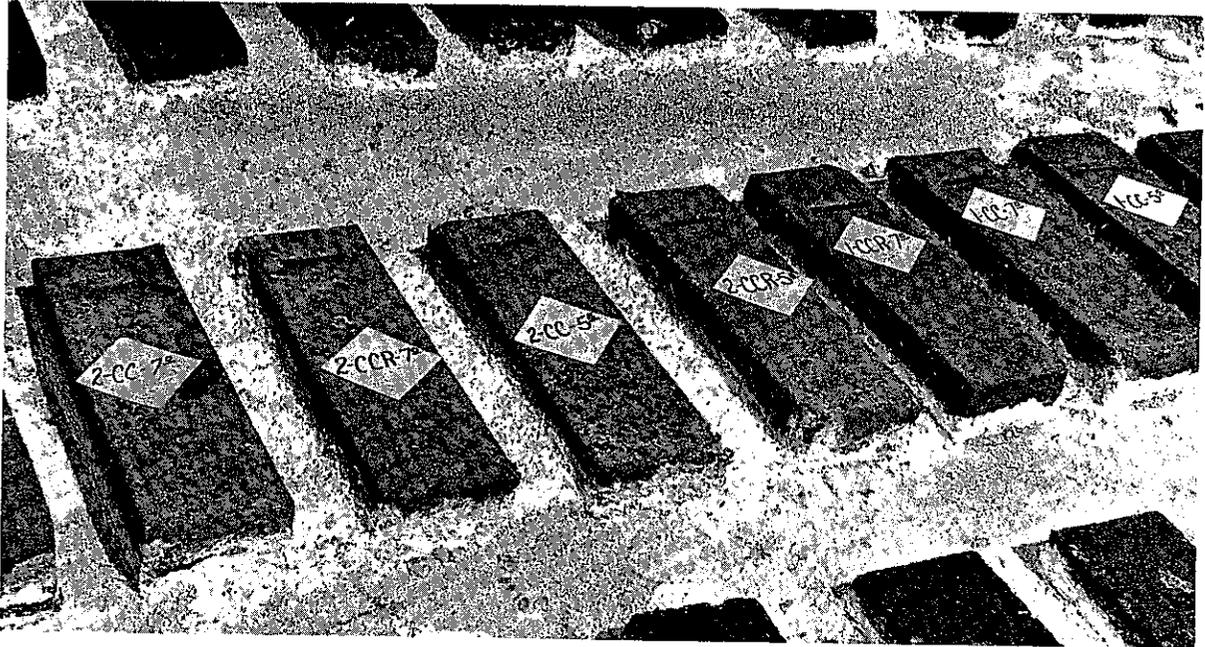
Concrete beams made with shrinkage compensated cement after 8 months sulfate exposure. Beams with "R" at end of designation are internally restrained. Note corners of beams where degradation has started.
